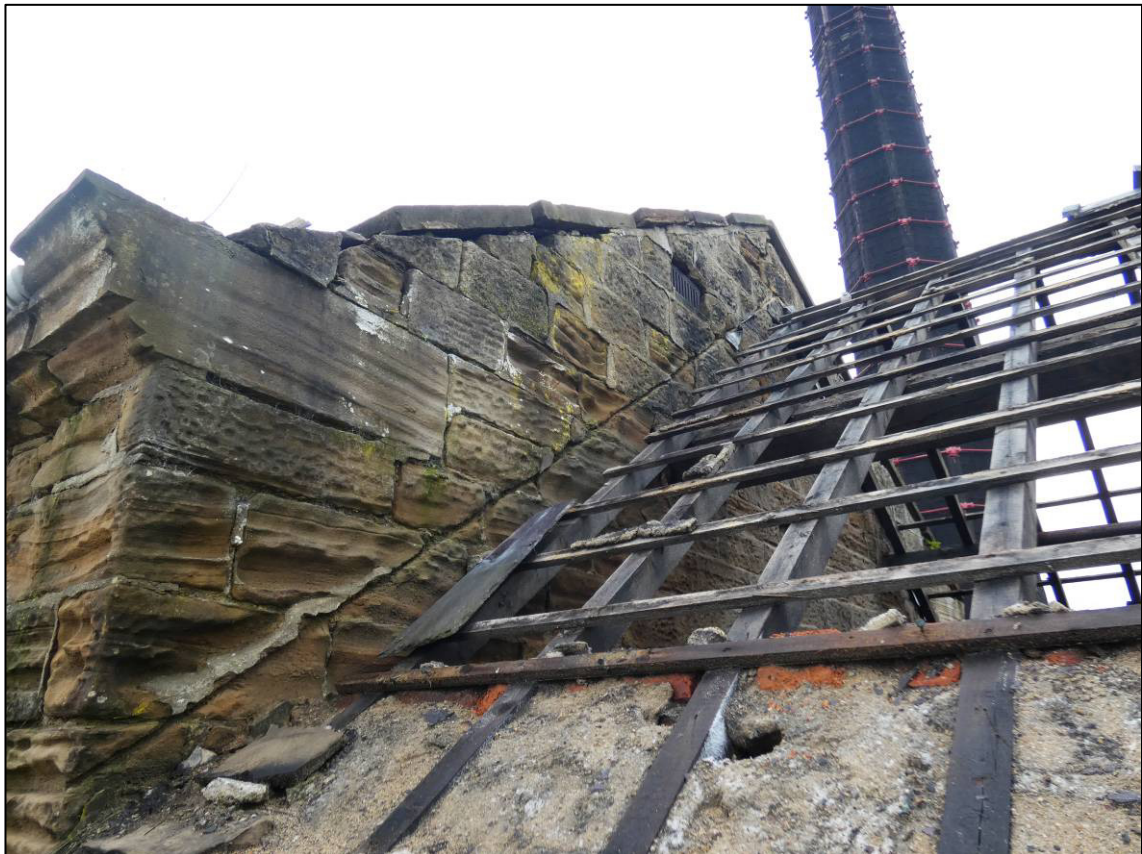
Southern engine house, north gable, looking SW (photo 2398).
